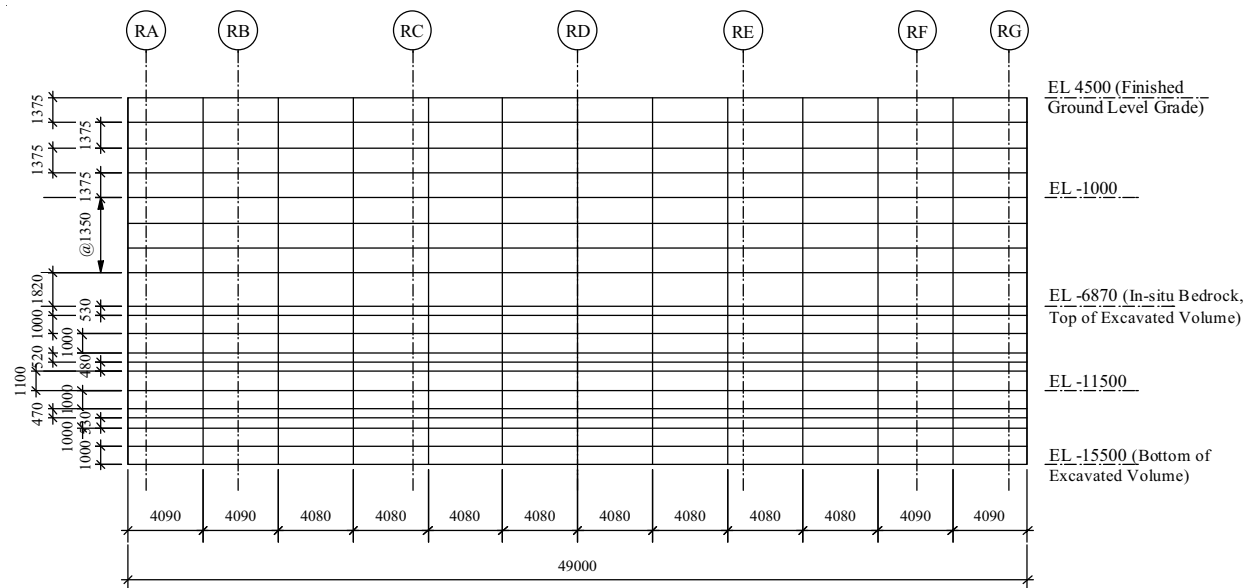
SASSI2000 Plate Elements for RB/FB Exterior Walls [EF3 SUP 3.7-4]
